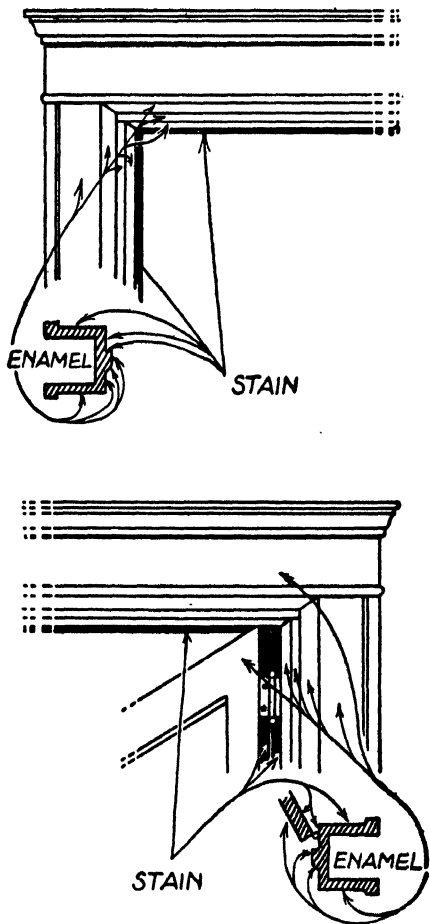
Staining Door Trim and Doors Which are Between Two Rooms Finished Differently Puzzles the Inexperienced as to Where to Stop. Above Shows the Correct Handling When One Room is Stained and the Other Enameled.
